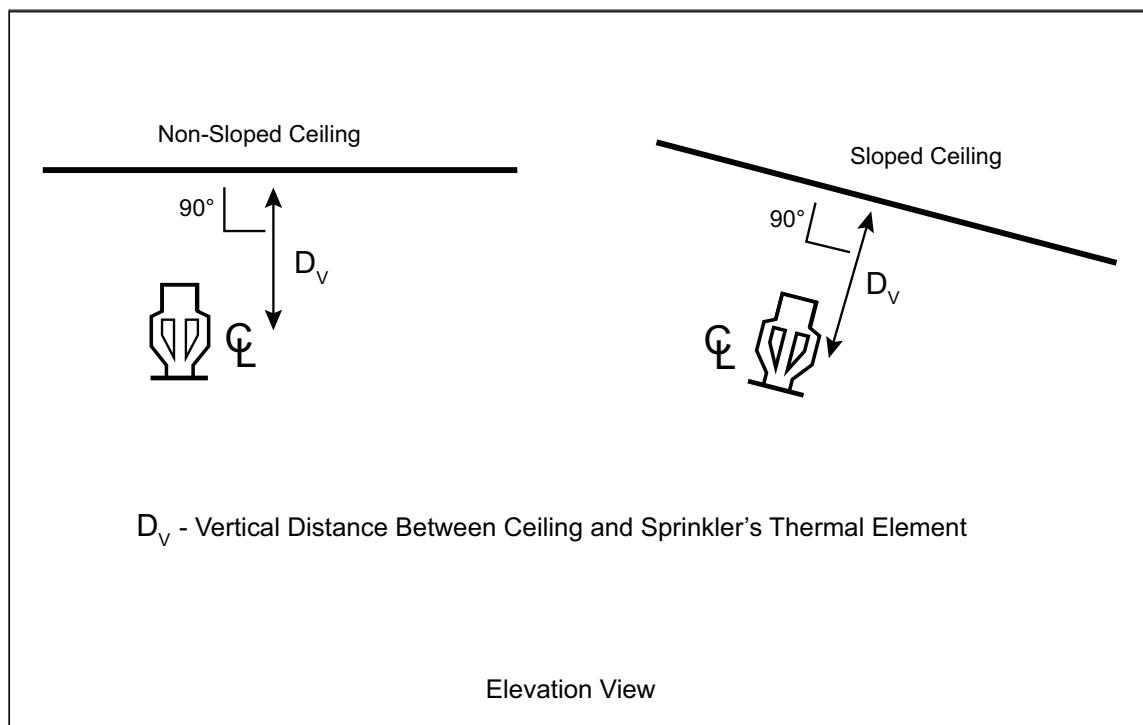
Measuring vertical distance between a Nonstorage sprinkler's thermal element and the underside of the ceiling
